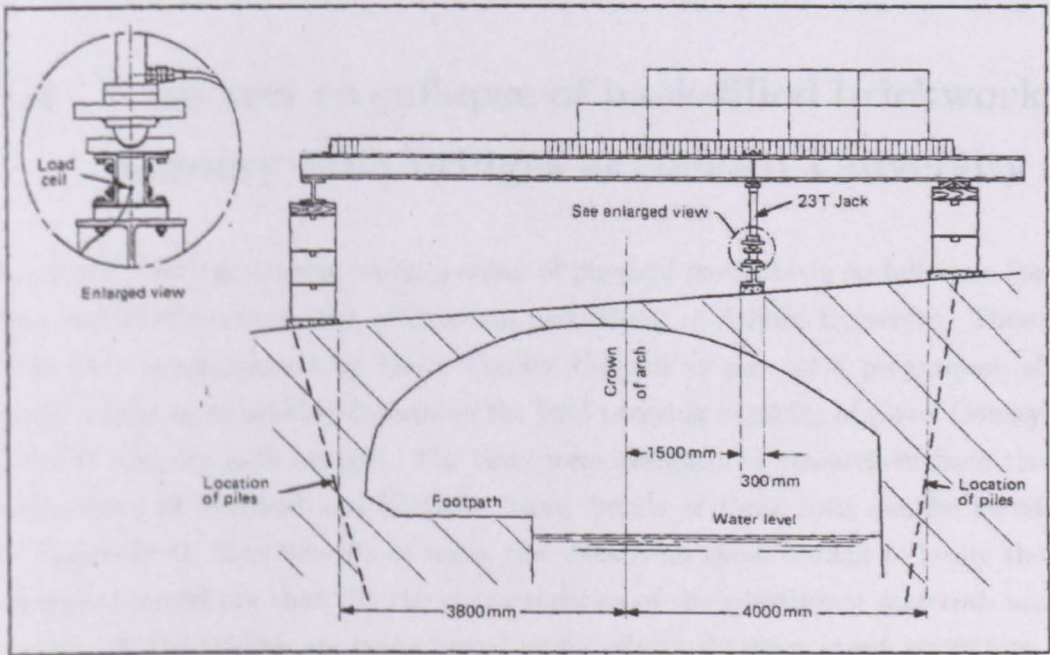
Prestwood Bridge: loading system (Page 1987)
